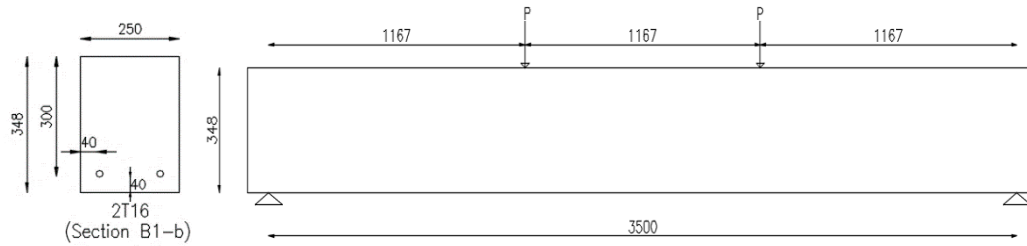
Cross sections and elevation details of beams tested by Gilbert and Nejadi [3] (all dimension in mm)
